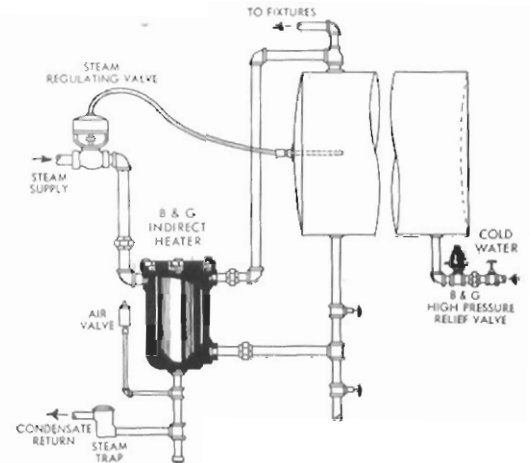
B & G Indirect Heaters may be used with low pressure steam.
